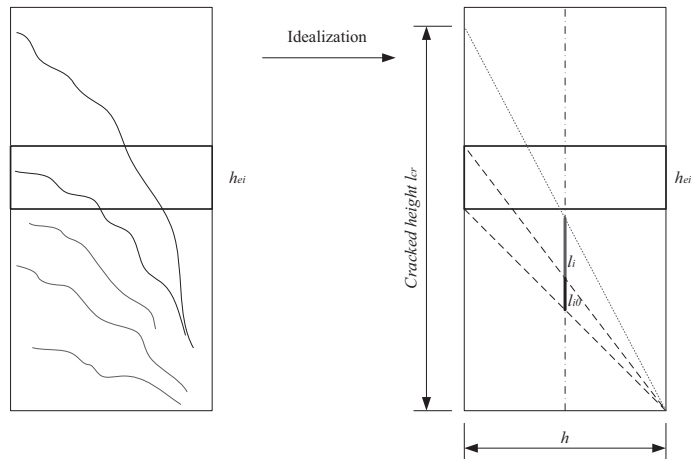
Cracked wall with element i at height L_i and idealization of crack pattern.
